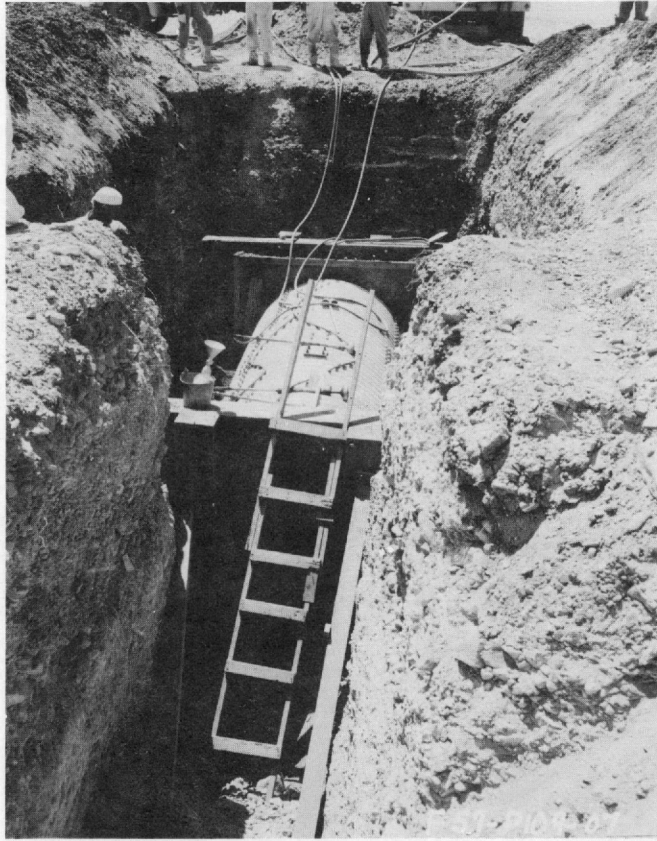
Exterior views of pipe in place prior to placing backfill.
